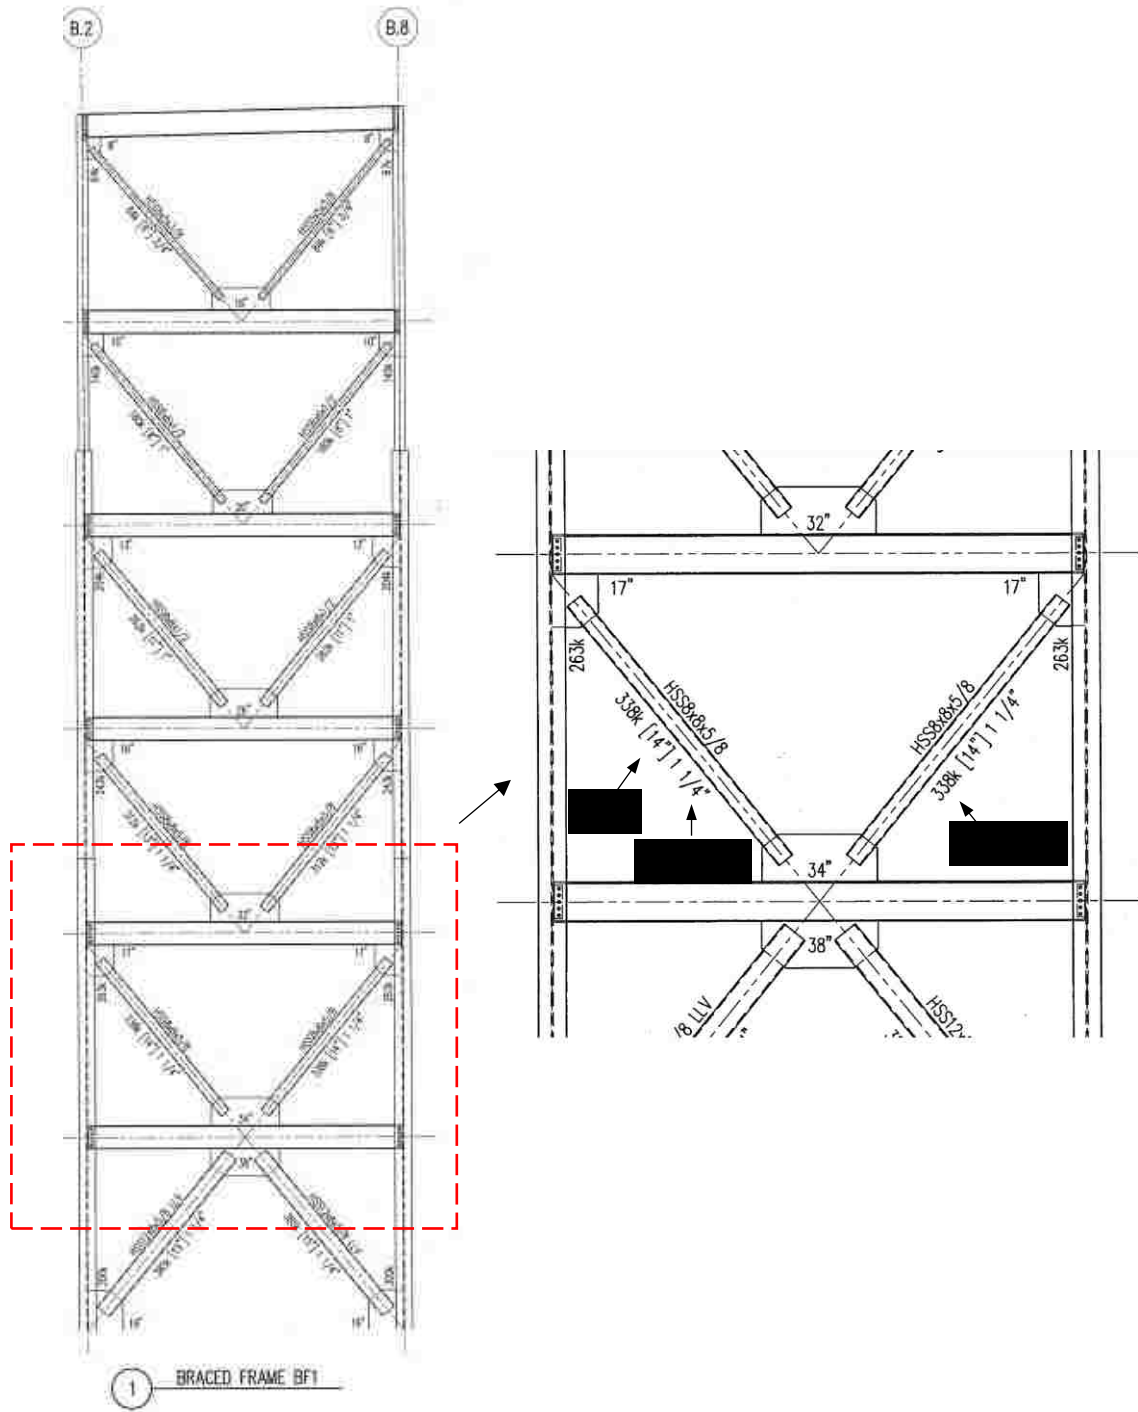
Connection design parameter for Building 2 (second story has been highlighted)
